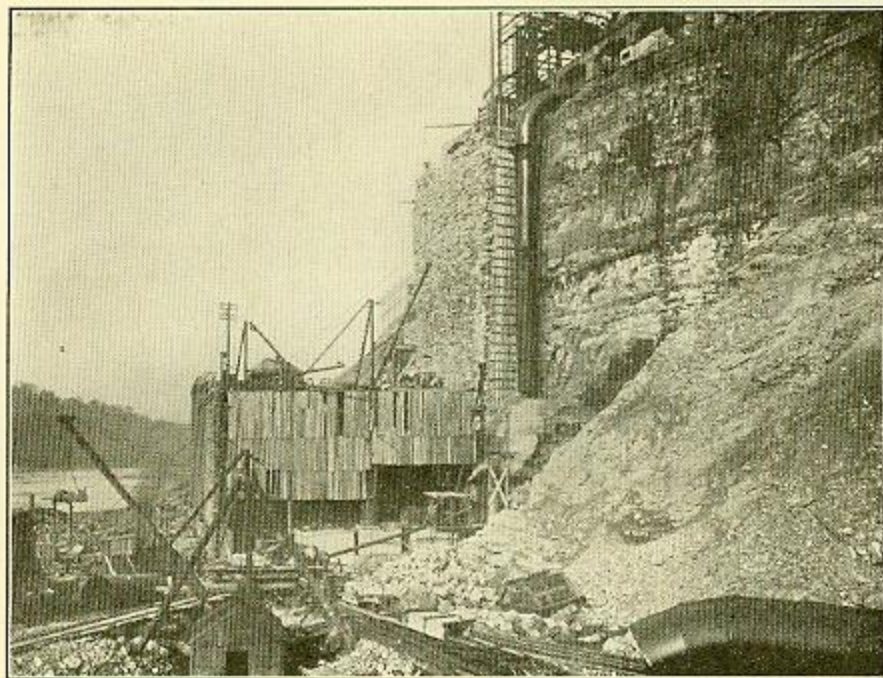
Construction Photographs showing Power House and Penstocks, The Niagara Falls Hydraulic Power & Mfg. Co.
